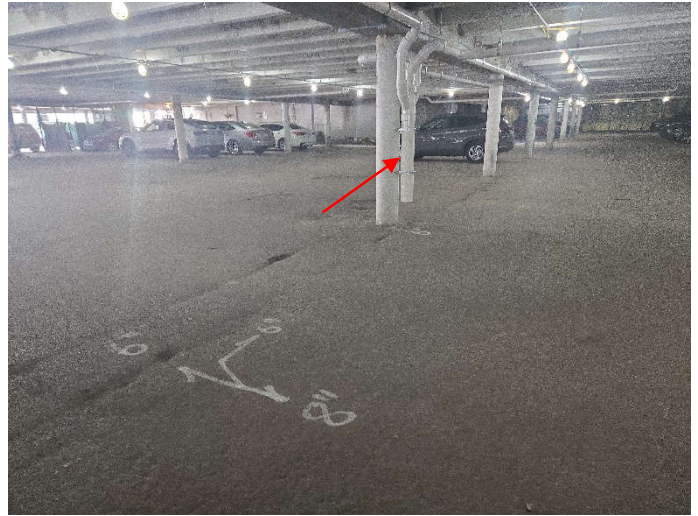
Plaza del Prado, Garage Deck Storm Drainage, Downspout ND3. Proposed underground layout. *The missing clean-out must be installed.
